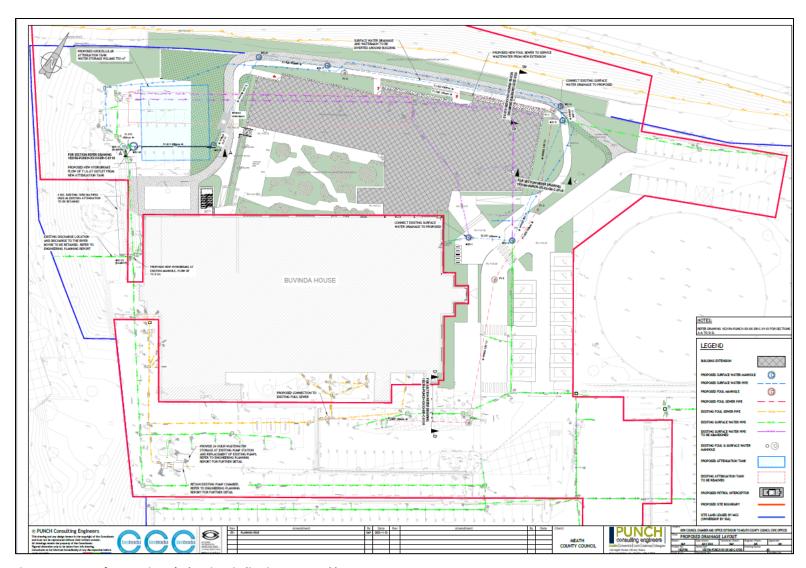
Excerpt from Engineer's drawings indicating proposed layout
